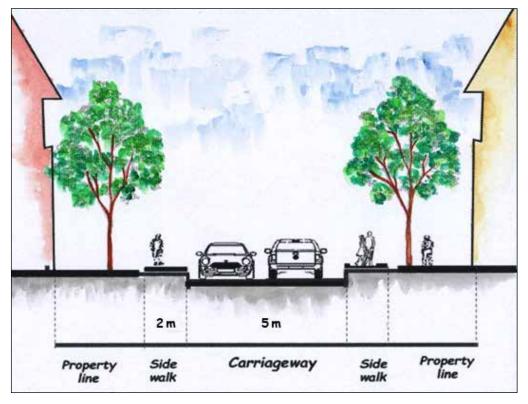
Cross section of the proposed roads widening in Tsunami resettlement area
